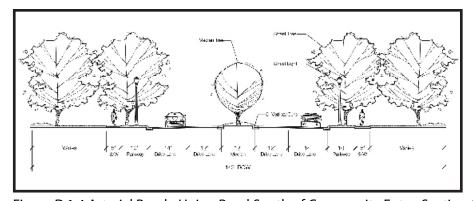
Arterial Road - Union Road South of Community Entry, Section C
